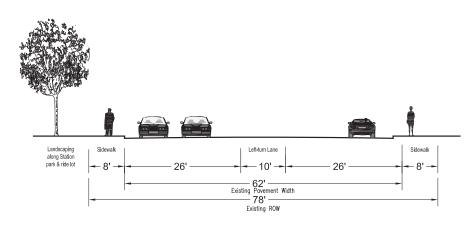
TYPICAL SECTION - RESIDENTIAL STREET
